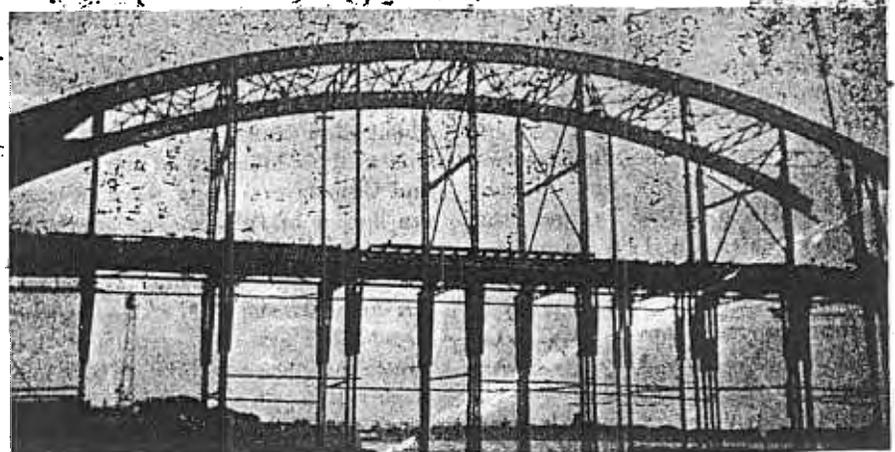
One of spans approaching completion. Note the jacking posts (with sway bracing between) used temporarily in place of some of the hangers to permit adjustment and closure of the arches. Adjustable steel falsework is also shown.
